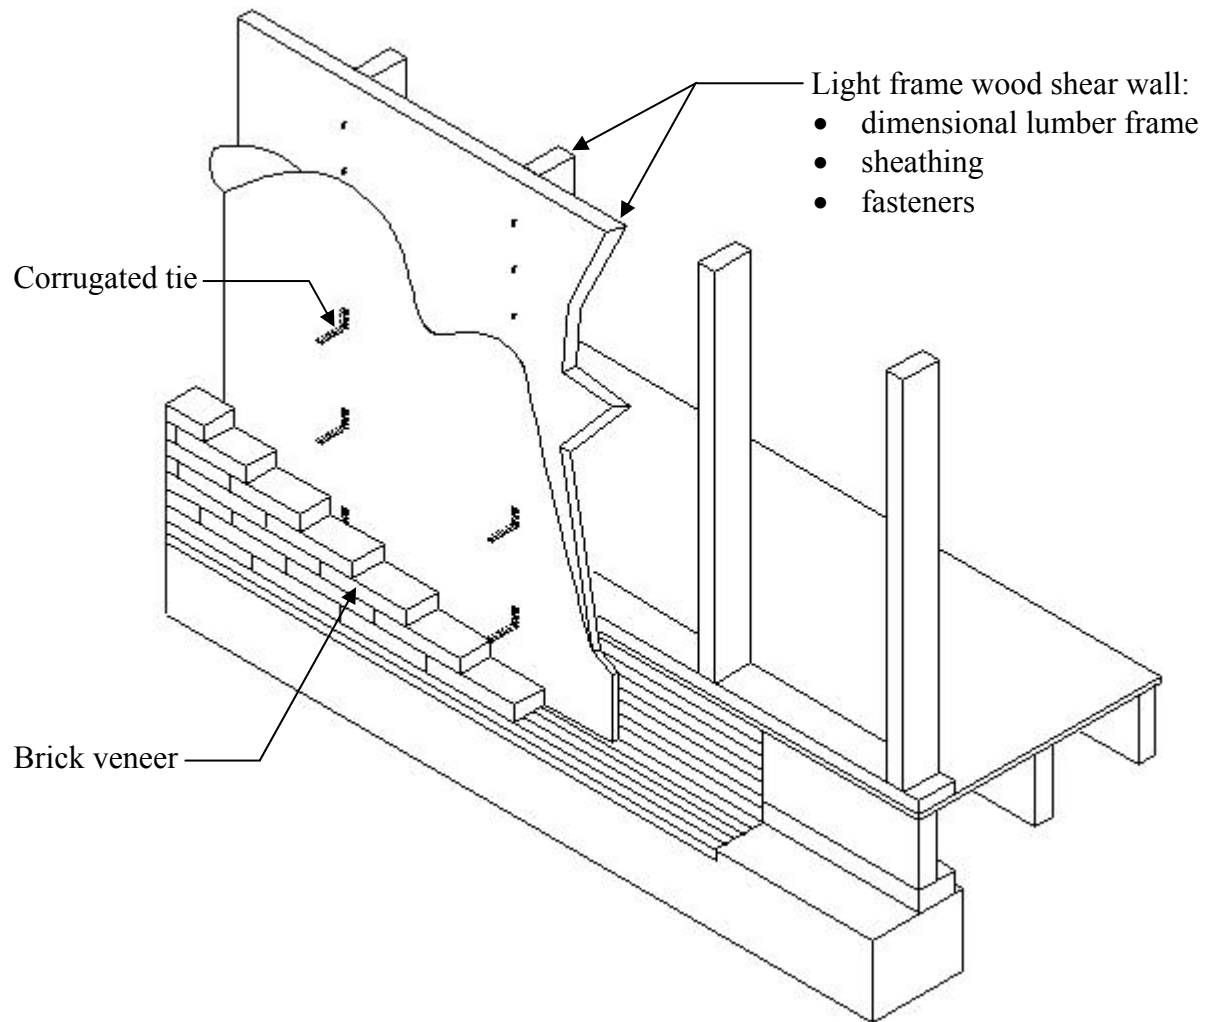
Components of an anchored brick veneer-light frame wood shear wall
